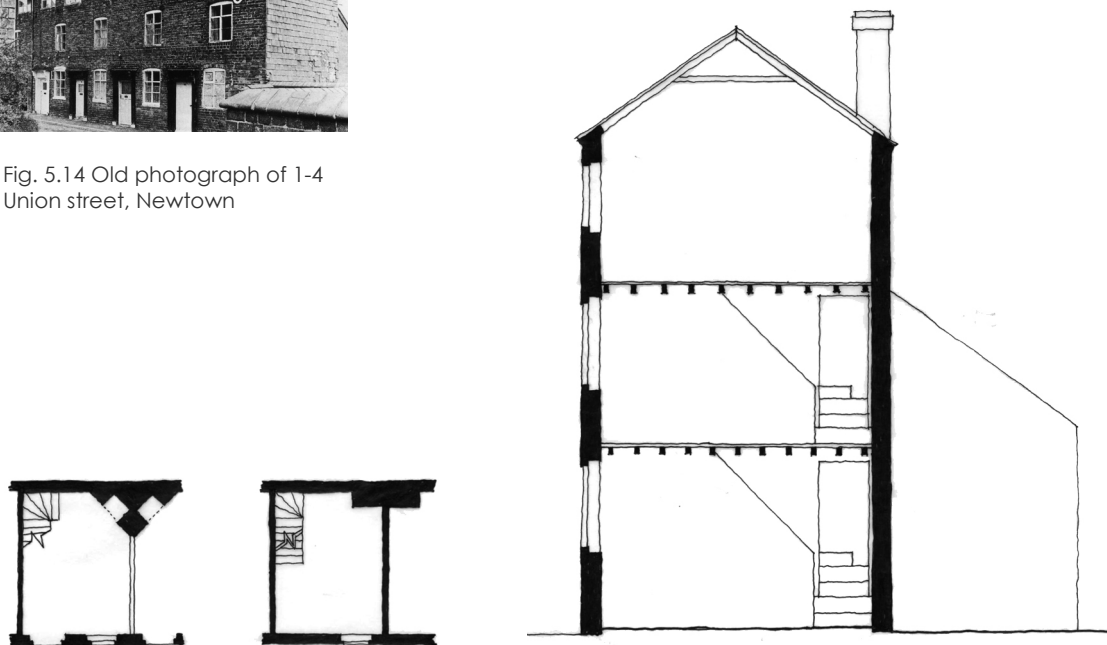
Plans of ground and middle floors; Fig. 5.16 Section of the three storey weavers' houses in Newtown with living accommodation on the lower floors and open workshops on the top floor
